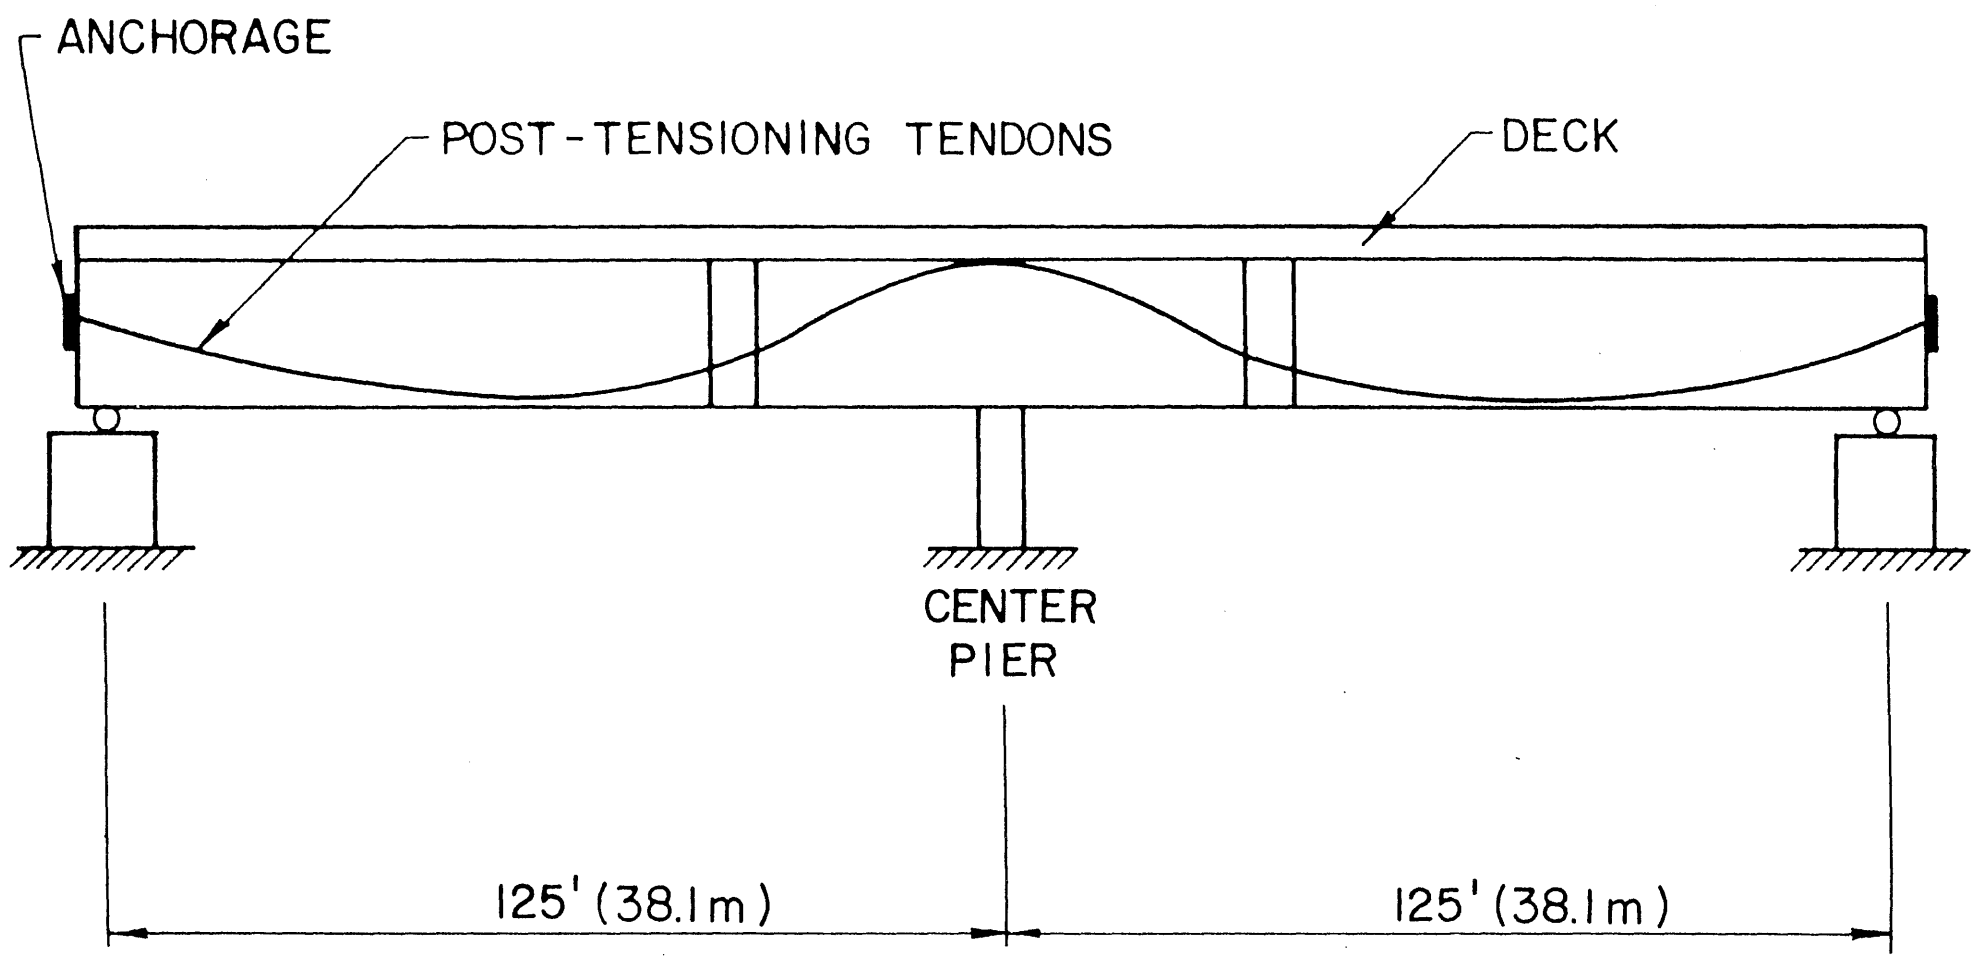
DECK AND JOINT CONCRETE CAST-IN-PLACE
